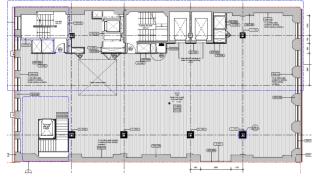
Beneficial House—Floor Plan, Level 1—showing proposed new stair and lift. (Source: Make + Architectus, A-285-12-01-0, 17 April 2019)
